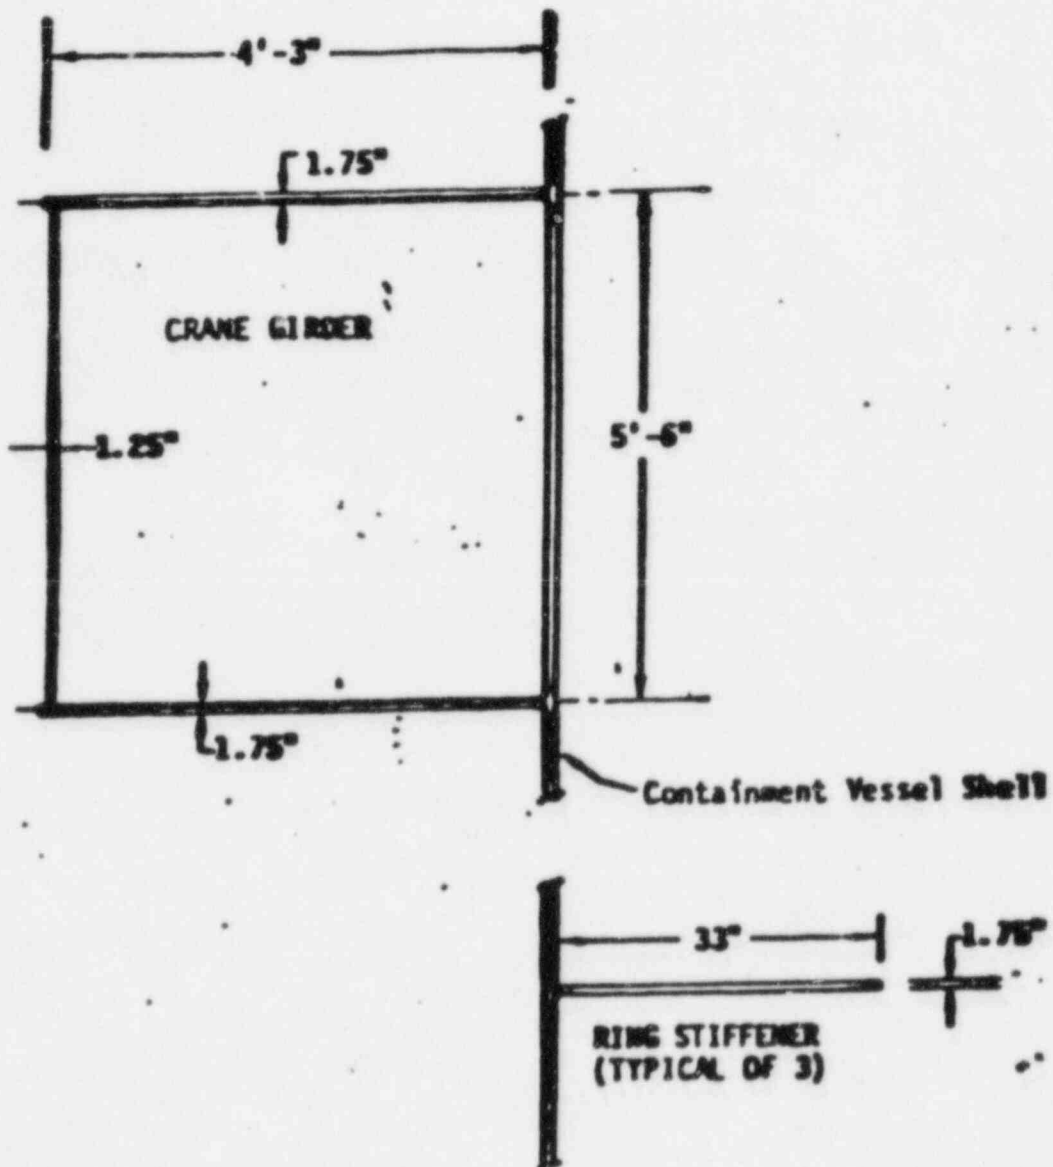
Detailed Geometry of Ring Stiffeners and Crane Girder
